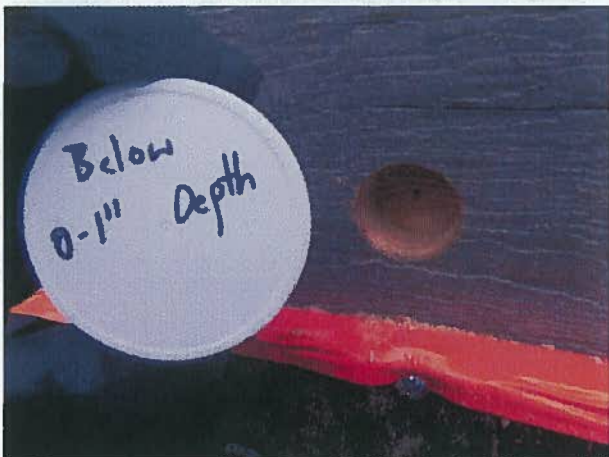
Sample location 1 on downstream gate, collected below the water line, 0 to 25 mm depth.
